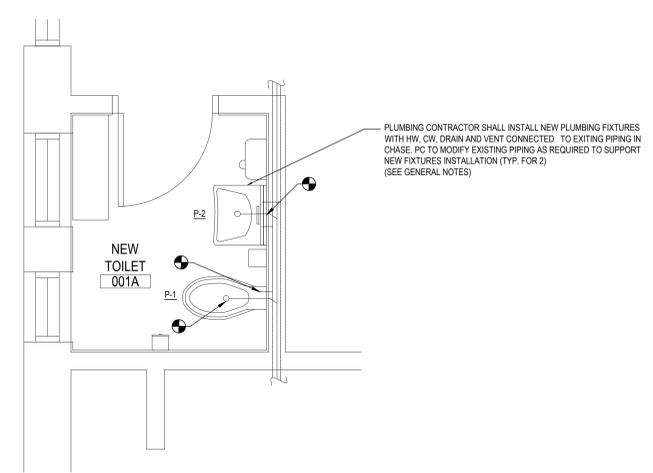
DETAIL "B" - PLUMBING NEW 1ST FLOOR TOILETS PLAN
